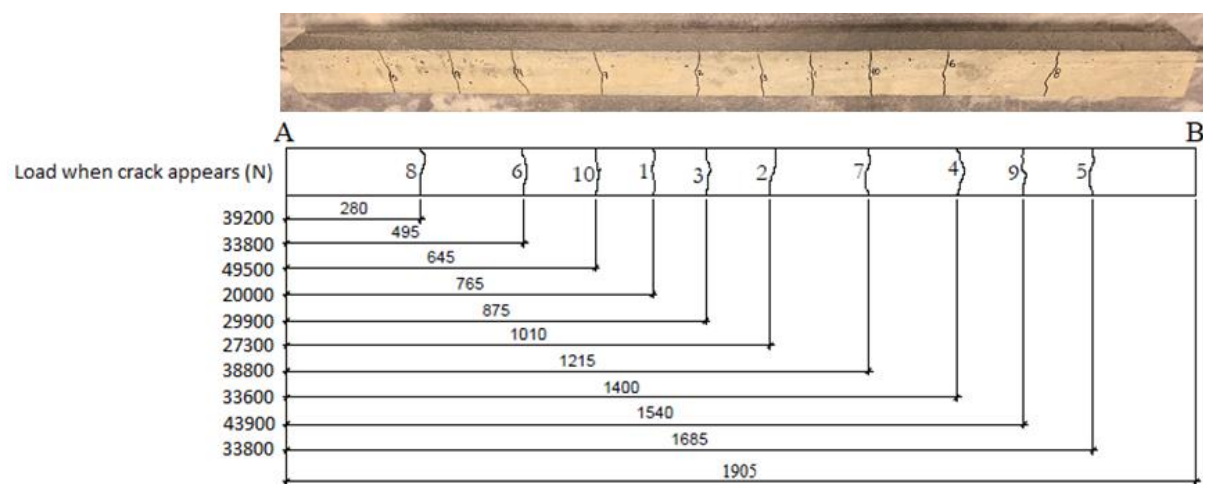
Prism test and crack pattern: #4 rGFRP – specimen 1.
